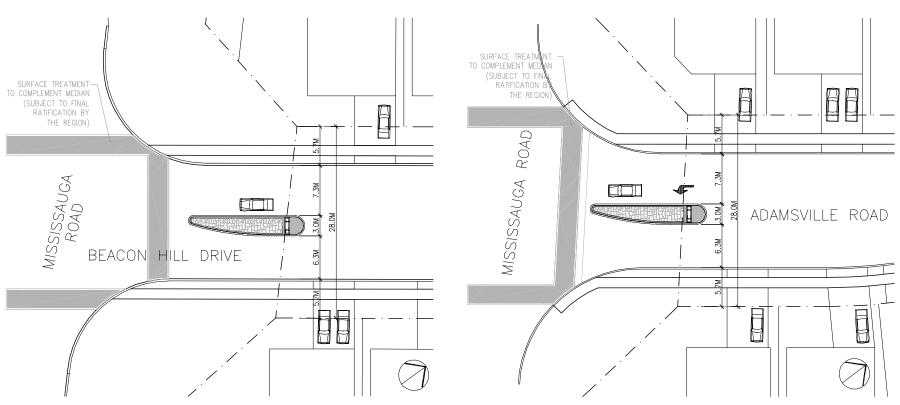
Concept Plan of Secondary Gateway Feature #5 (Mississauga Road & Beacon Hill Drive)
